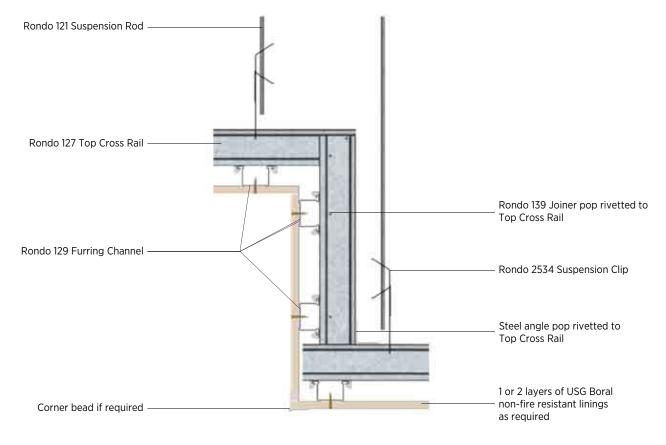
Typical Bulkhead Detail - Section Through Furring Channel
